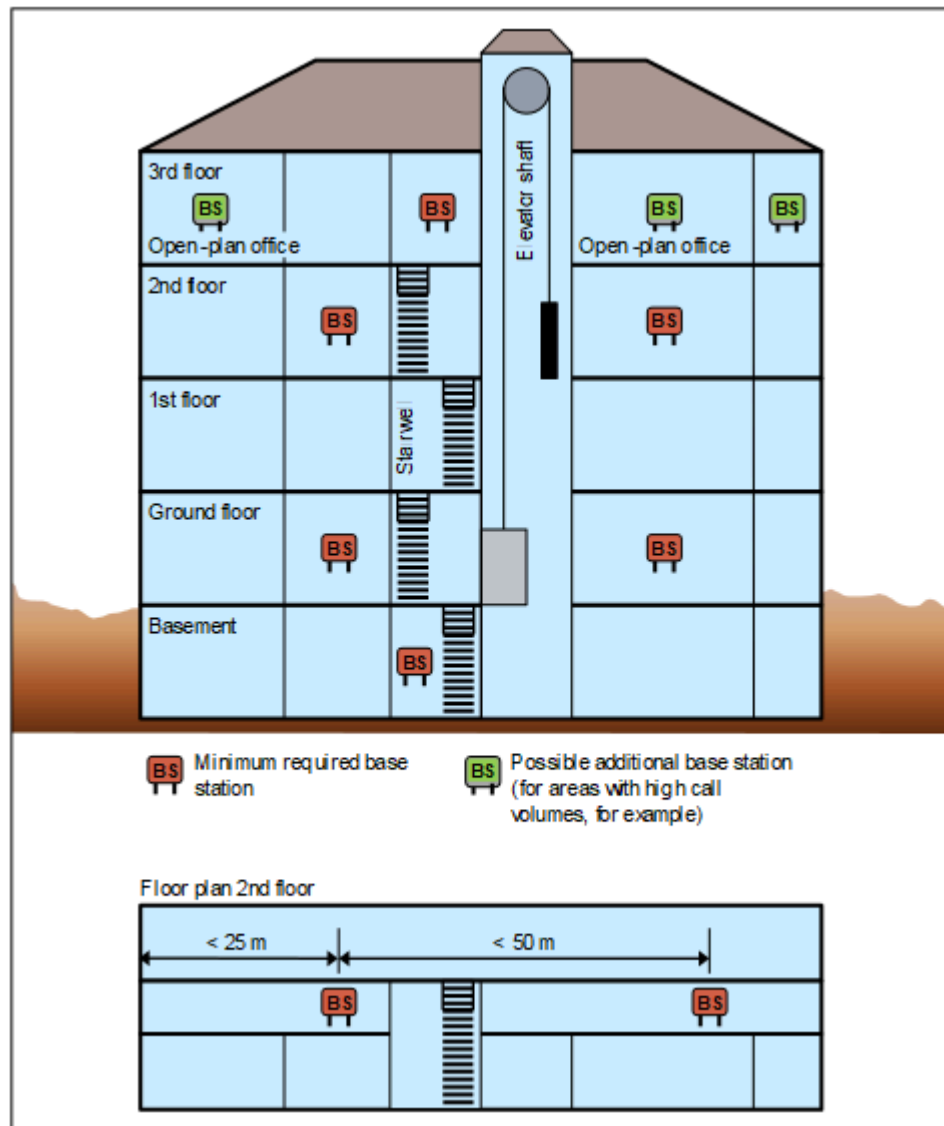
Example for the placement of base stations in steel concrete buildings with an interior made of brick and light-weight construction materials:
